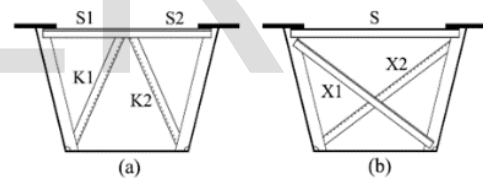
internal bracing for trapezoidal box girder: (a) K-frame and (b) X-frame [2]
